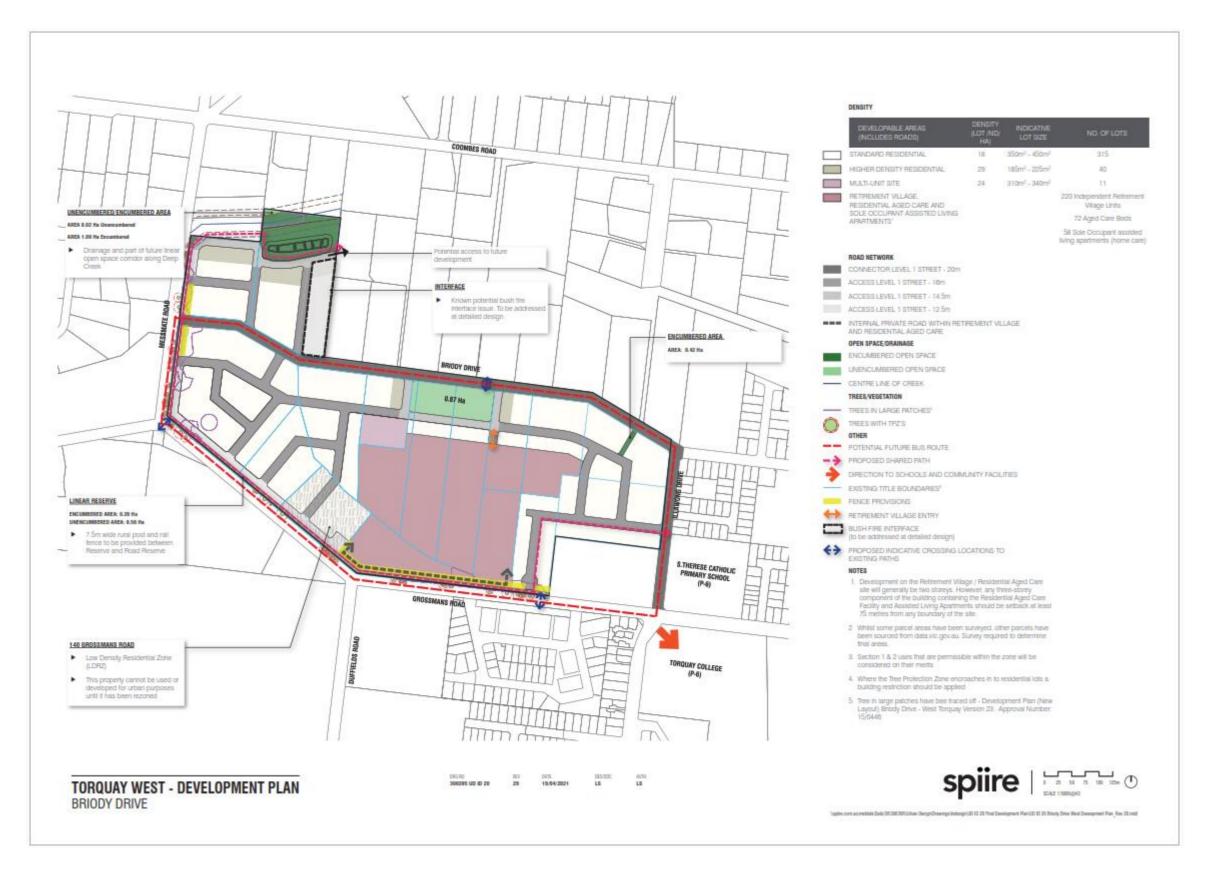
Draft development plan (note that the proposed stormwater outfall north of Briody Drive is not highlighted on this plan)
